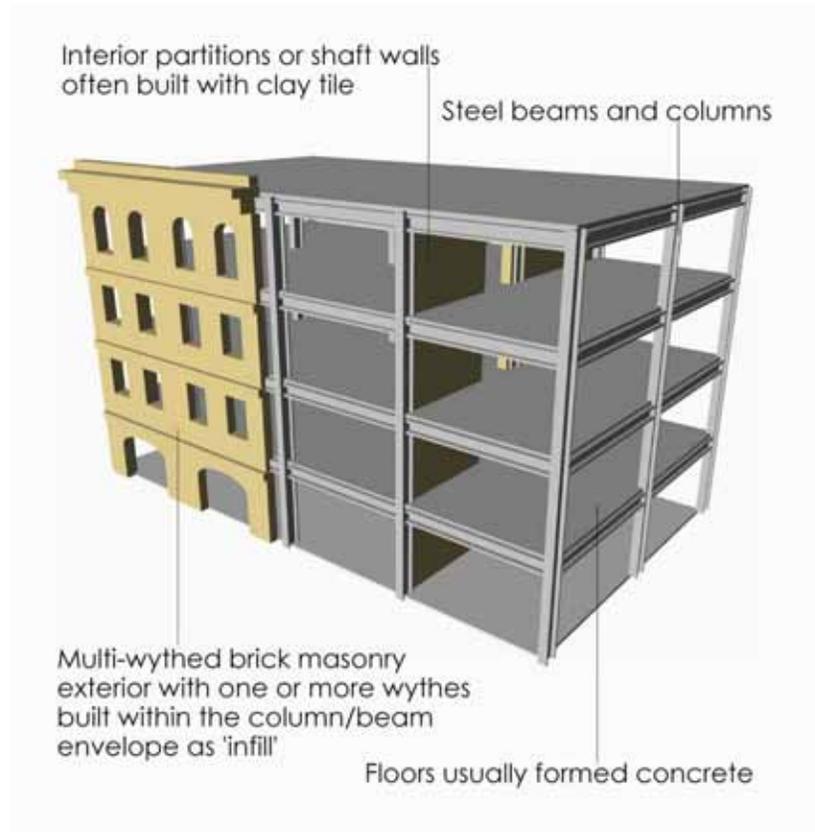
Building Type S5: Steel Frames with Infill Masonry Shear Walls
